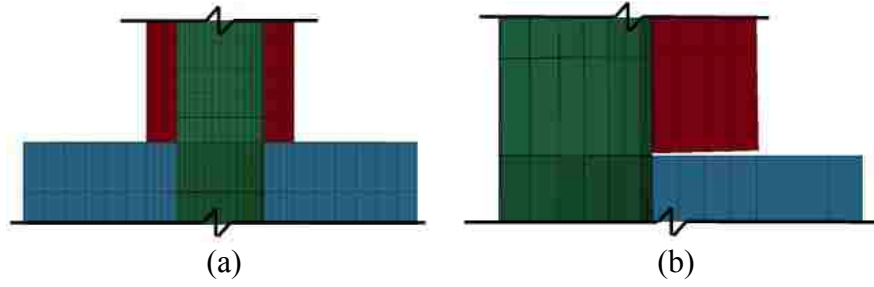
Column-footing connection (a) closed connection, (b) uplift of the heel of the connection
